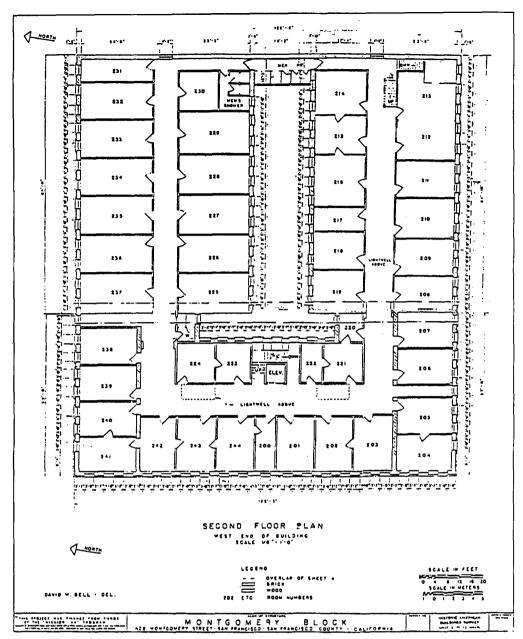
Second-Floor Plan Montgomery Block Building (Adapted, Cardwell et al. 1958)
